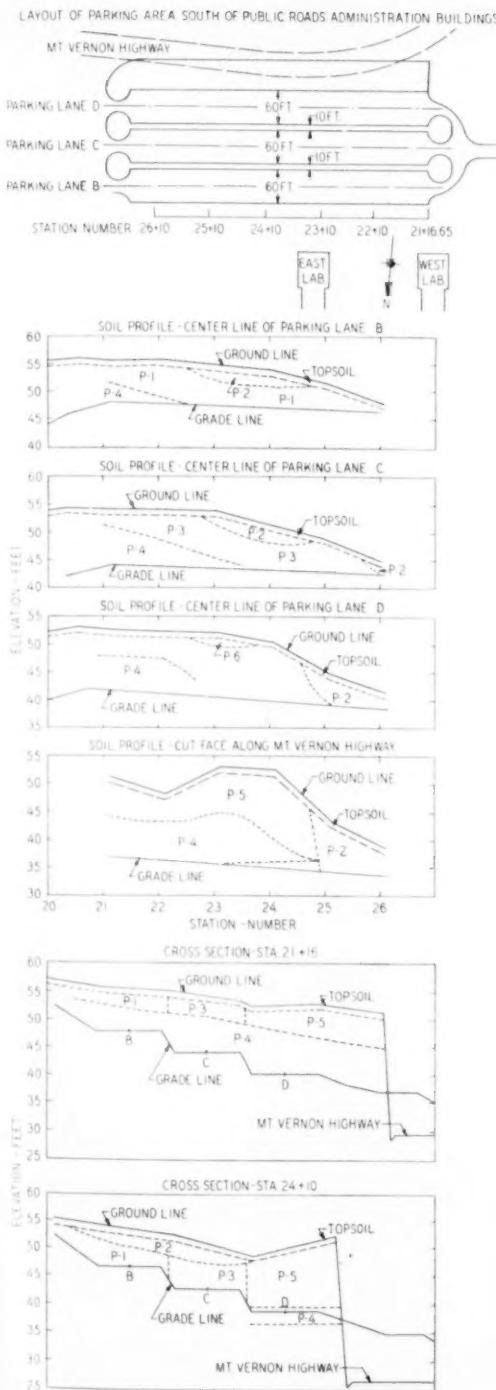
LAYOUT, SOIL PROFILES, AND CROSS SECTIONS OF BINDER SOIL PIT AT PARKING AREA.
